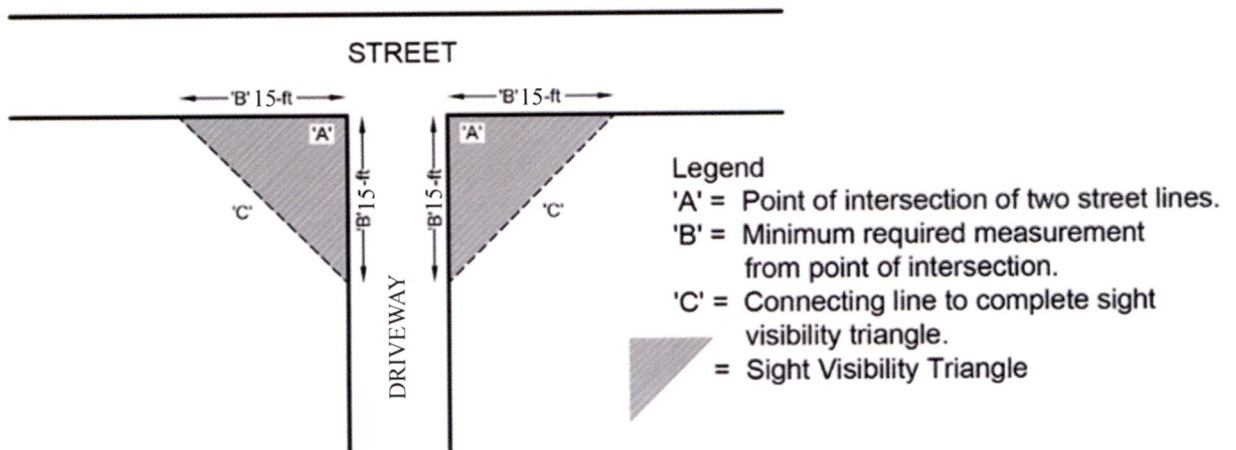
(c)2 - Sight visibility triangle at the intersection of a street or driveway.
